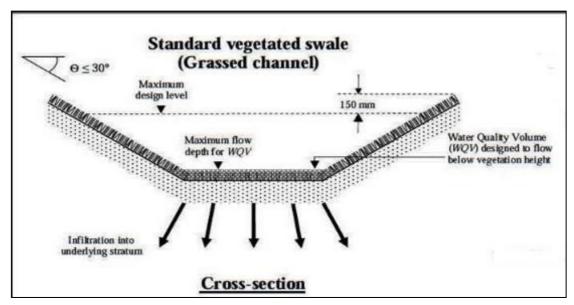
Cross section through proposed stormwater grass canals as part of the project
